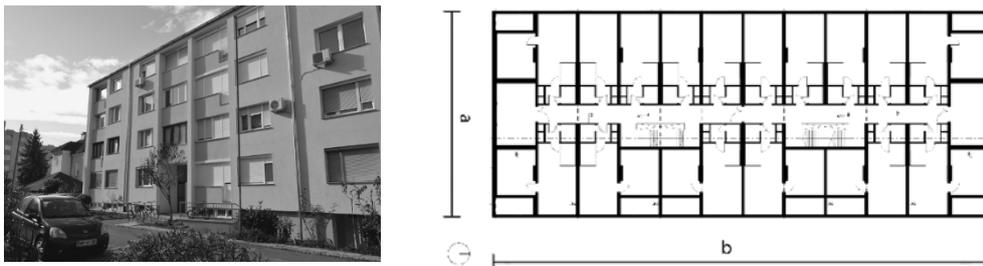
Existing case study building – EB C (left) and its floorplan (right)
